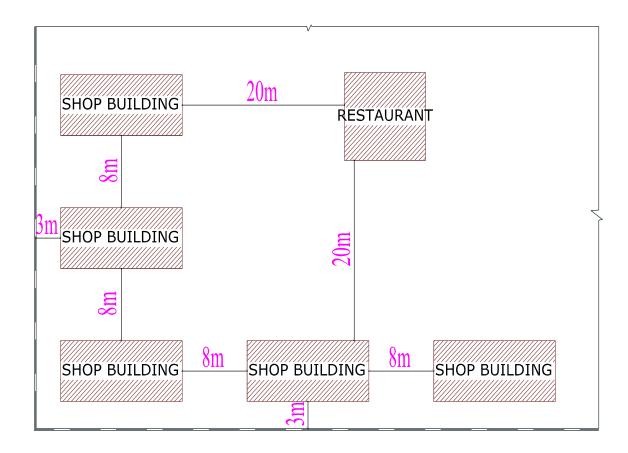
Part of the proposed site plan of a market with the spaces of 20 metres between the restaurant and other buildings.
